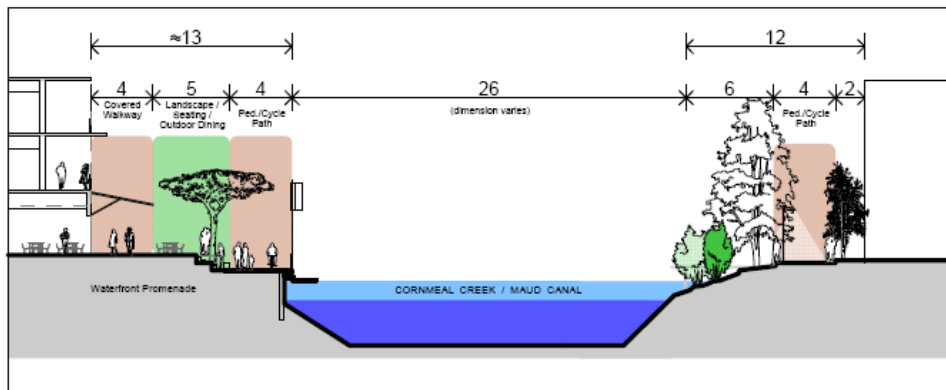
A Maroochydore/Kuluin local plan elements
